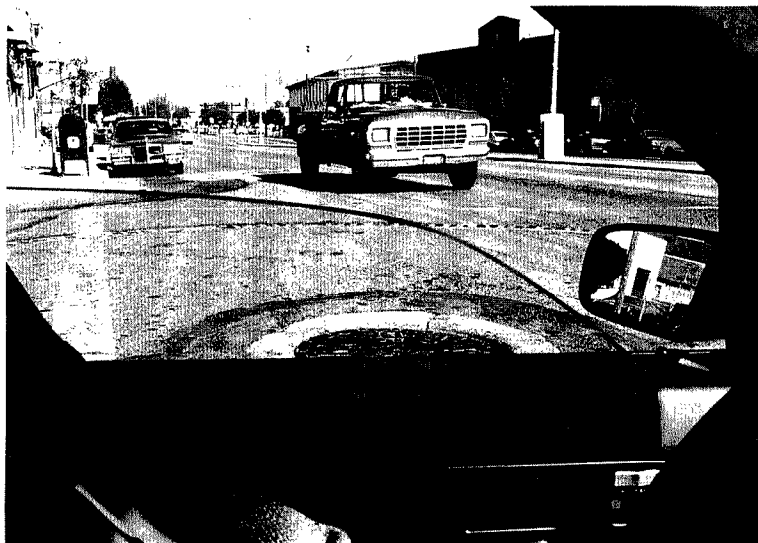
A San Francisco street intersection showing the manhole and edge bricks of a cistern.
